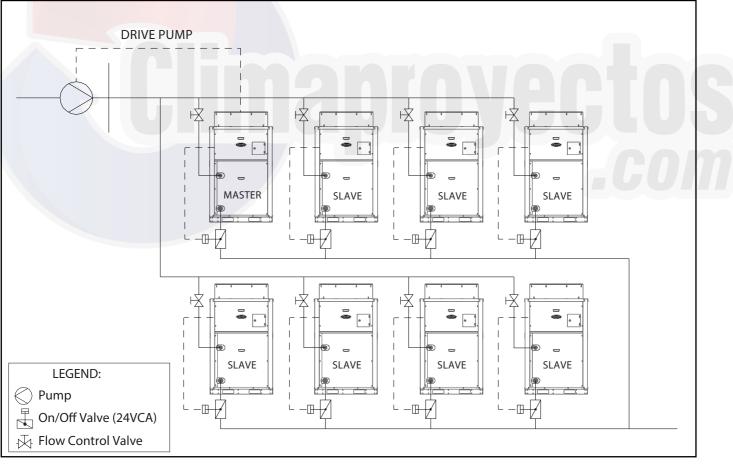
Typical Single-Pump Interconnection Schematic Drawing
